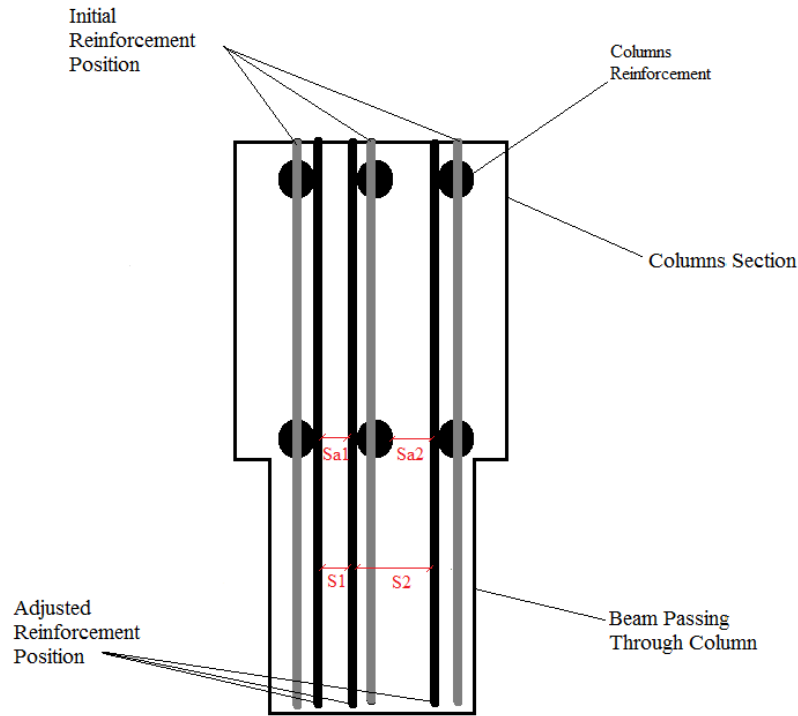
Adjustment of the beams longitudinal reinforcements' positions to avoid clashes with the columns reinforcement inside the beam-column joint
